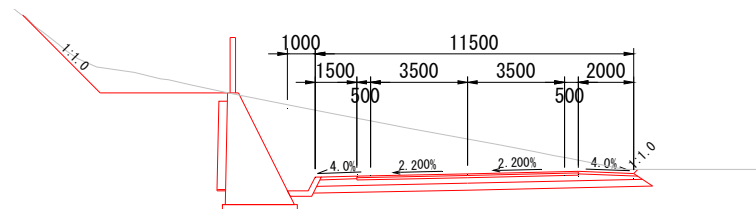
Approach Road Section on the Side of the Ending Point
